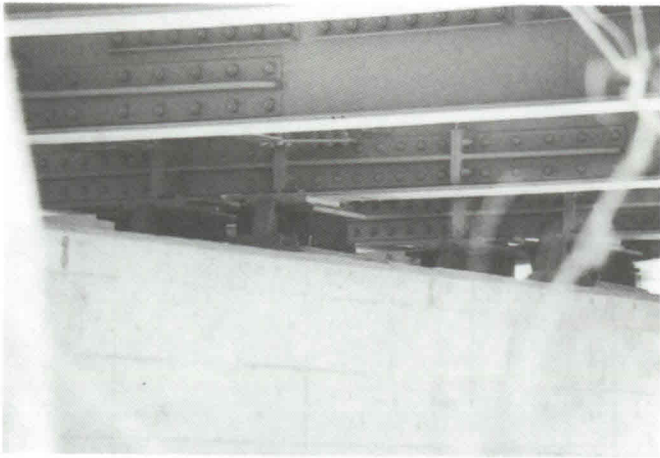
Drop on the road surface on Higashi-Kobe Bridge
